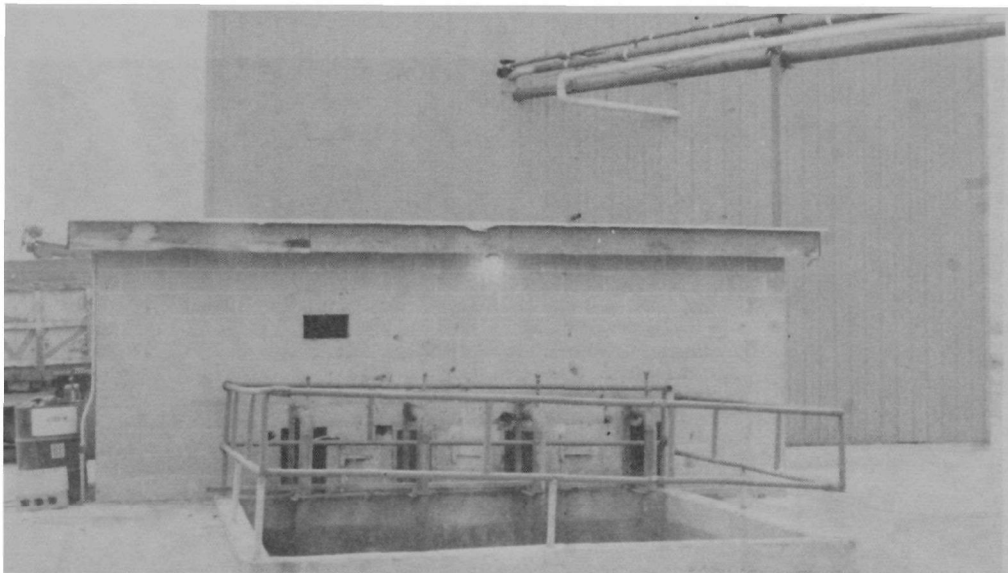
DEHYDRATOR BUILDING WITH SUMP AND LIFT STATION
